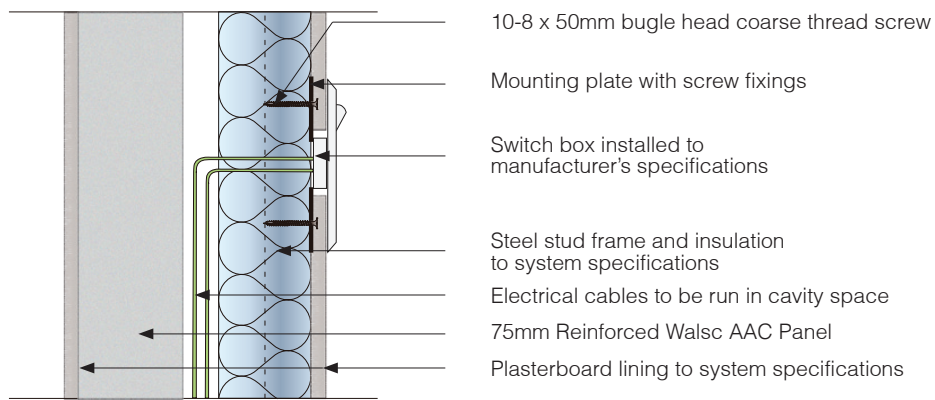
Power Switch / Outlet to Steel Stud or Furring Channel Detail
